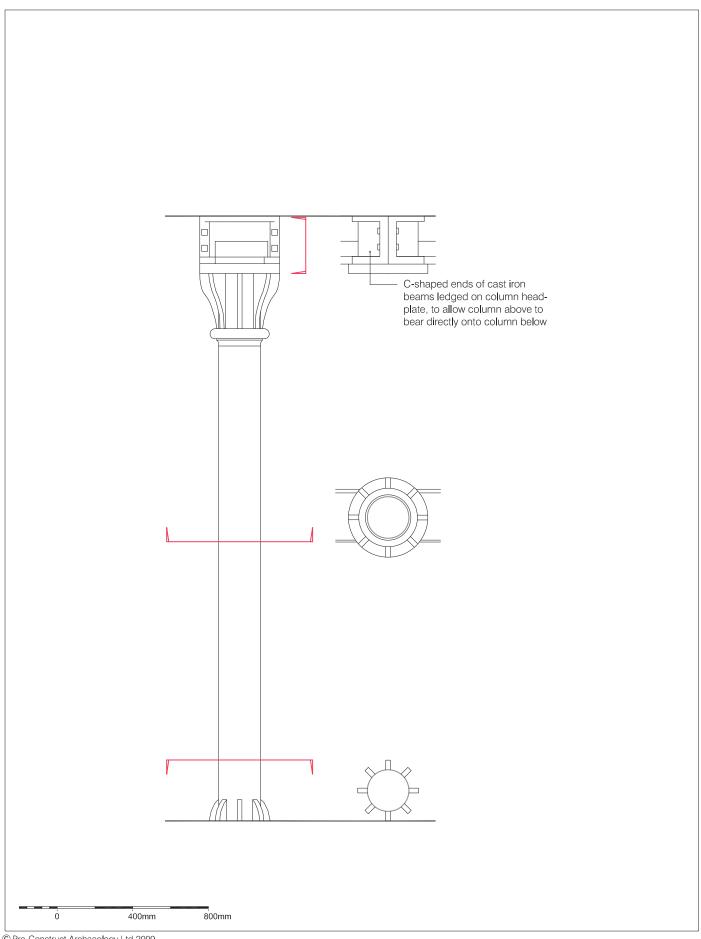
Detailed Elevation and Cross Sections of a Cast Iron Column, Room CF03G3 Coal and Fish Offices 1:20 at A4
